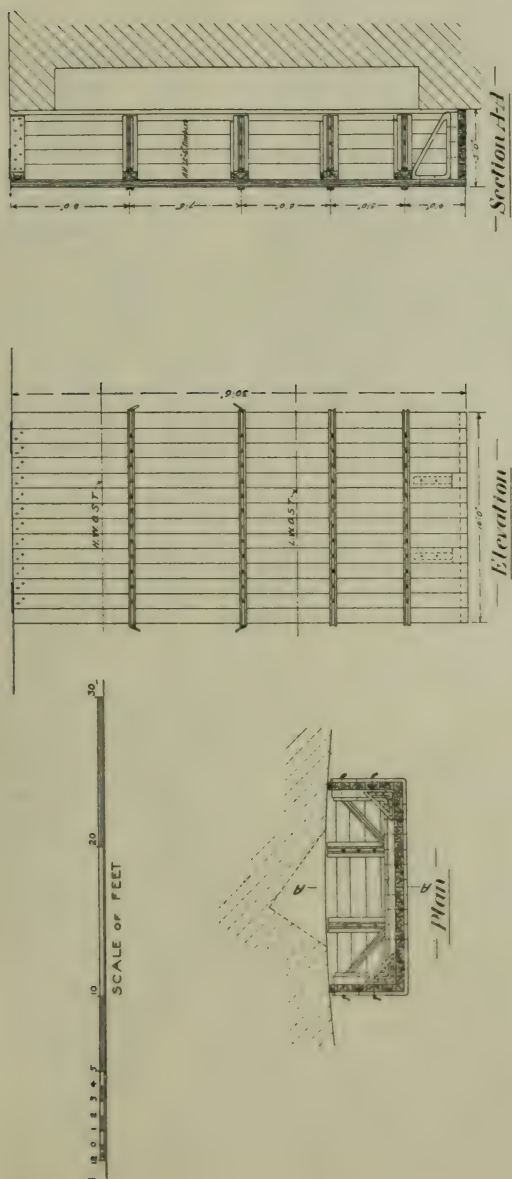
L. & S.W.R. SOUTHAMPTON DOCKS: DRY DOCK No. 3: LIMPET DAM AS CONSTRUCTED.
